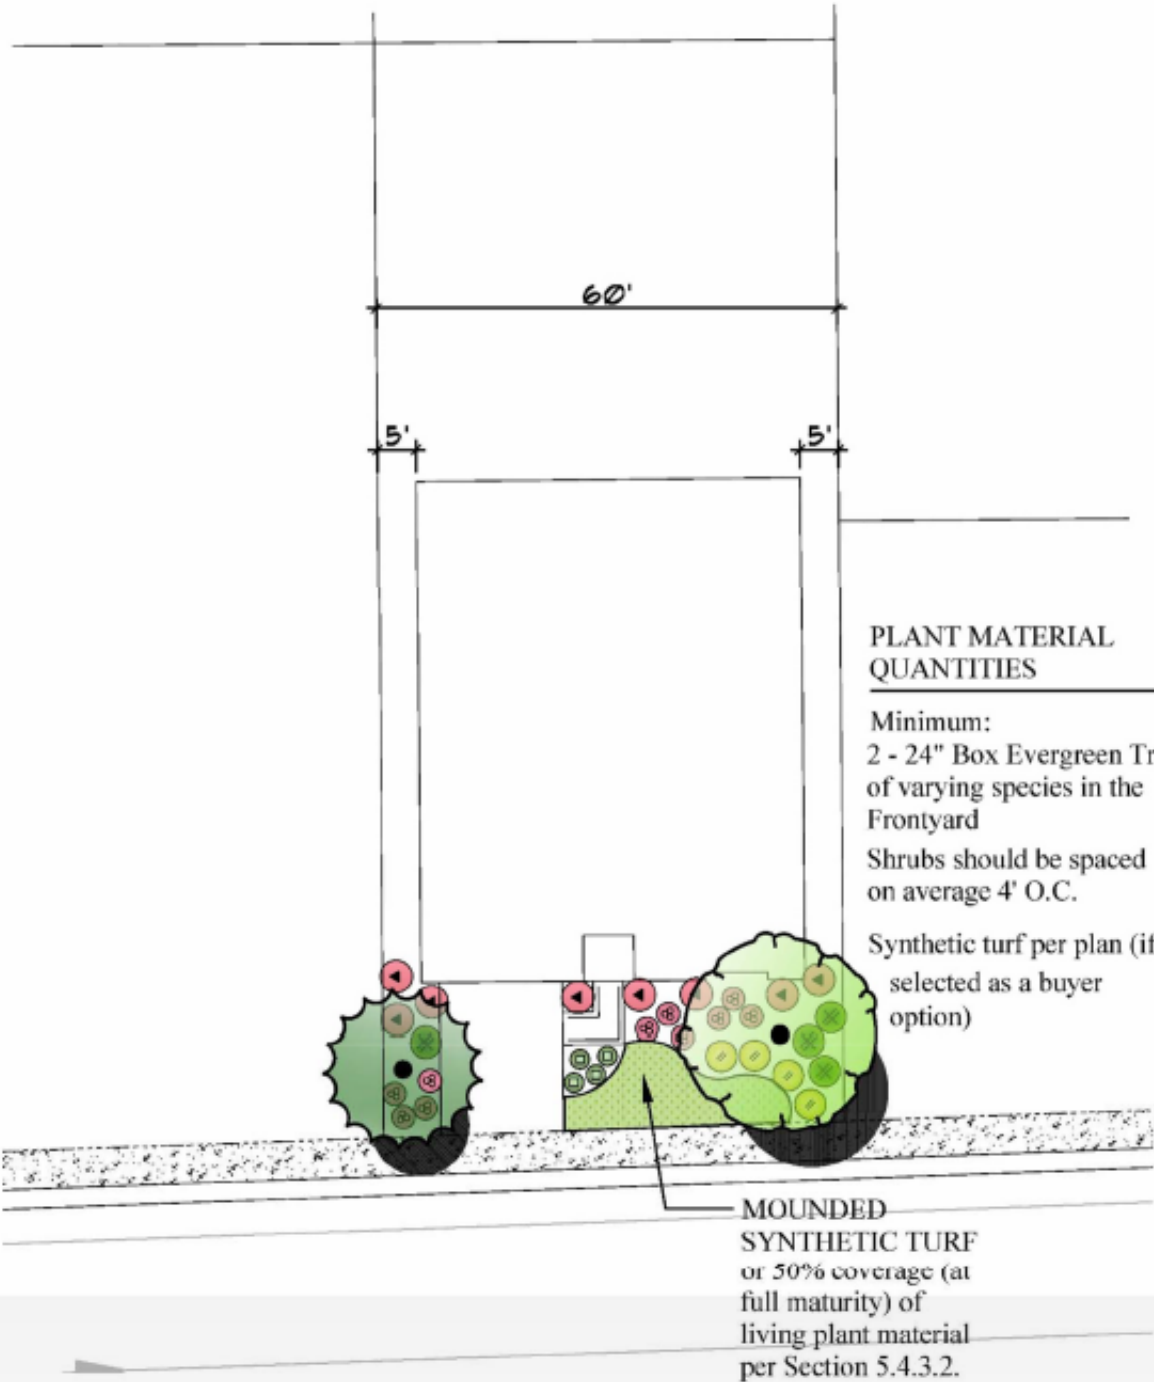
M: TYPICAL CORNER FRONT YARD
